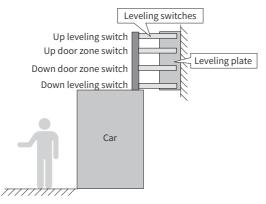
Installation positions of two leveling switches and two door zone switches
